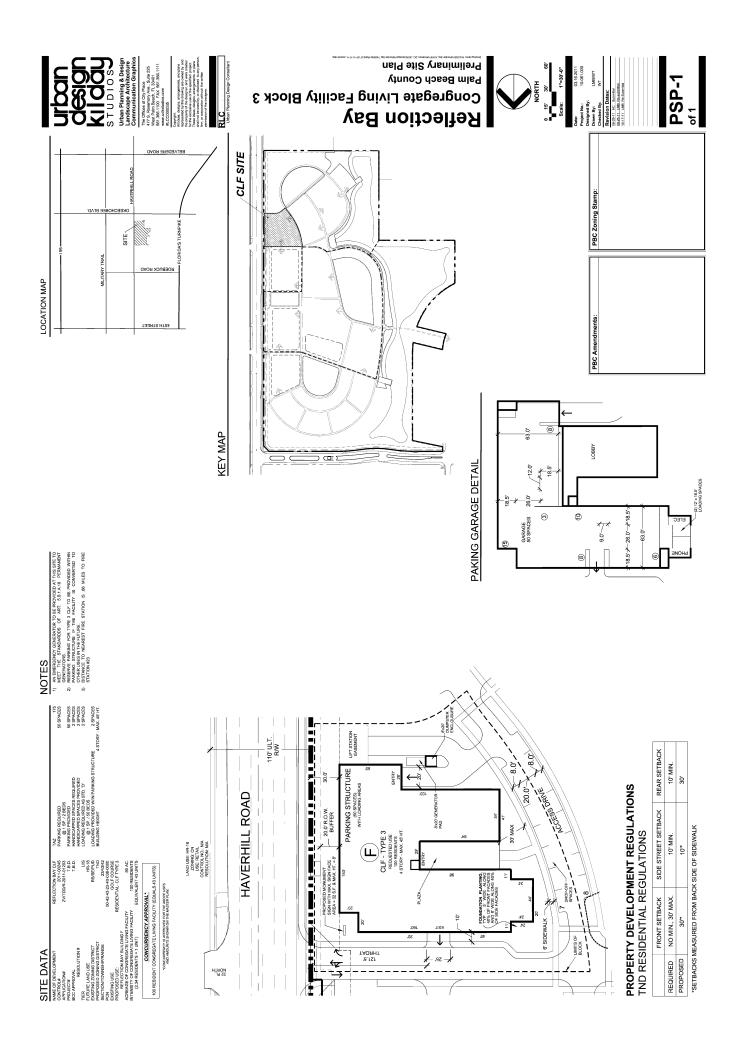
CLF Preliminary Site Plan dated 10/12/11
